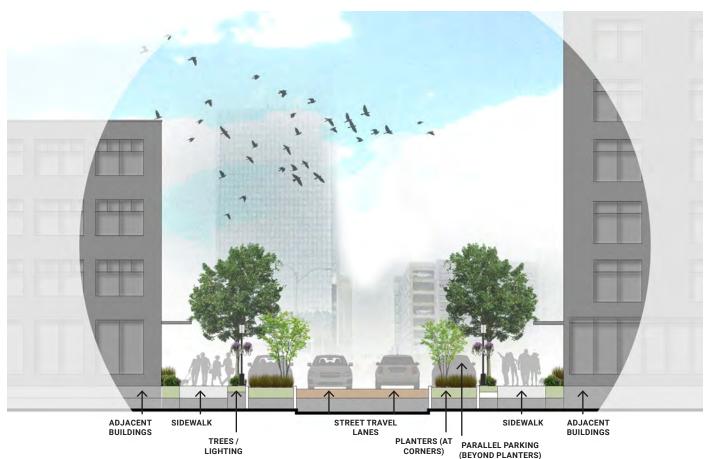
7th Avenue Conceptual Streetscape Plan
